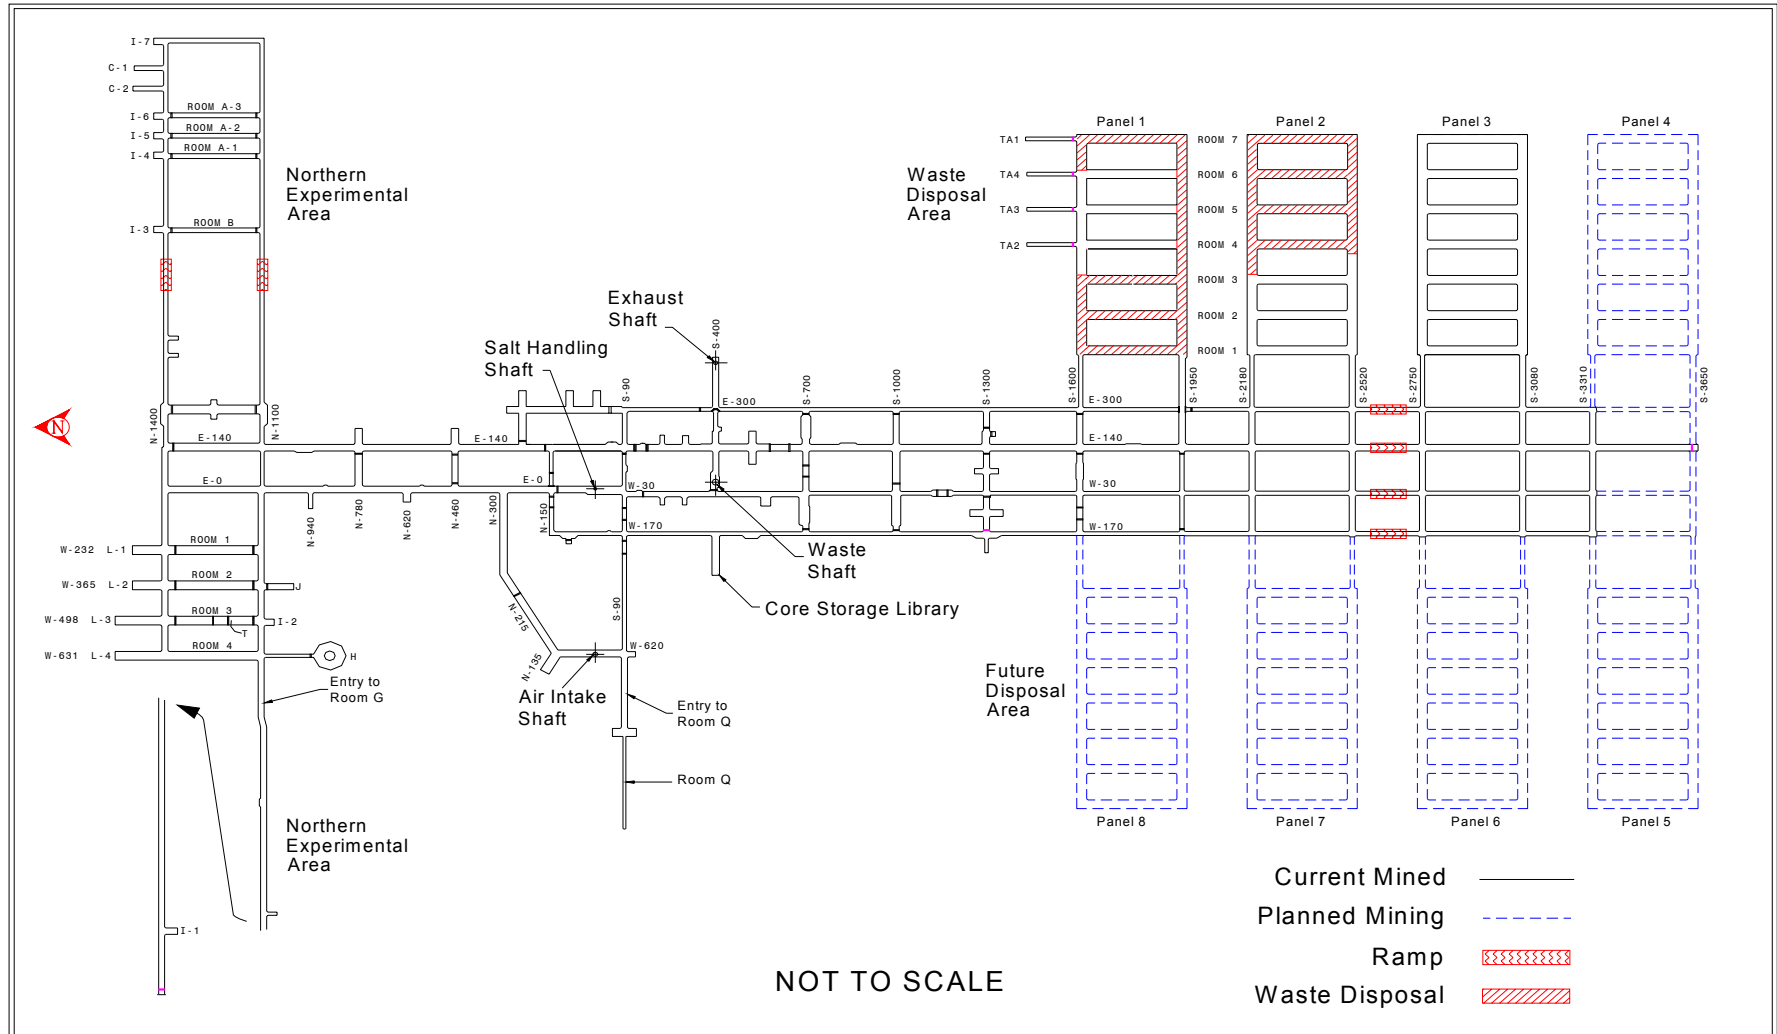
Underground Mining and Waste Disposal Configuration as of 6/30/04
